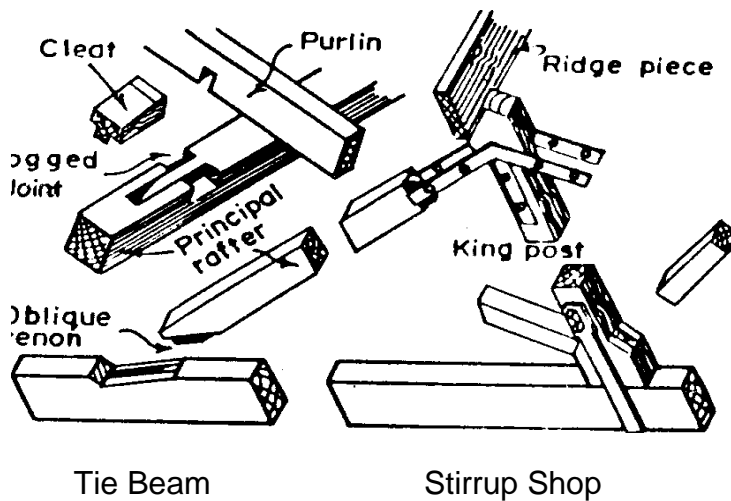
FIG DETAILS OF JOINTS IN KING-POST TRUSS
